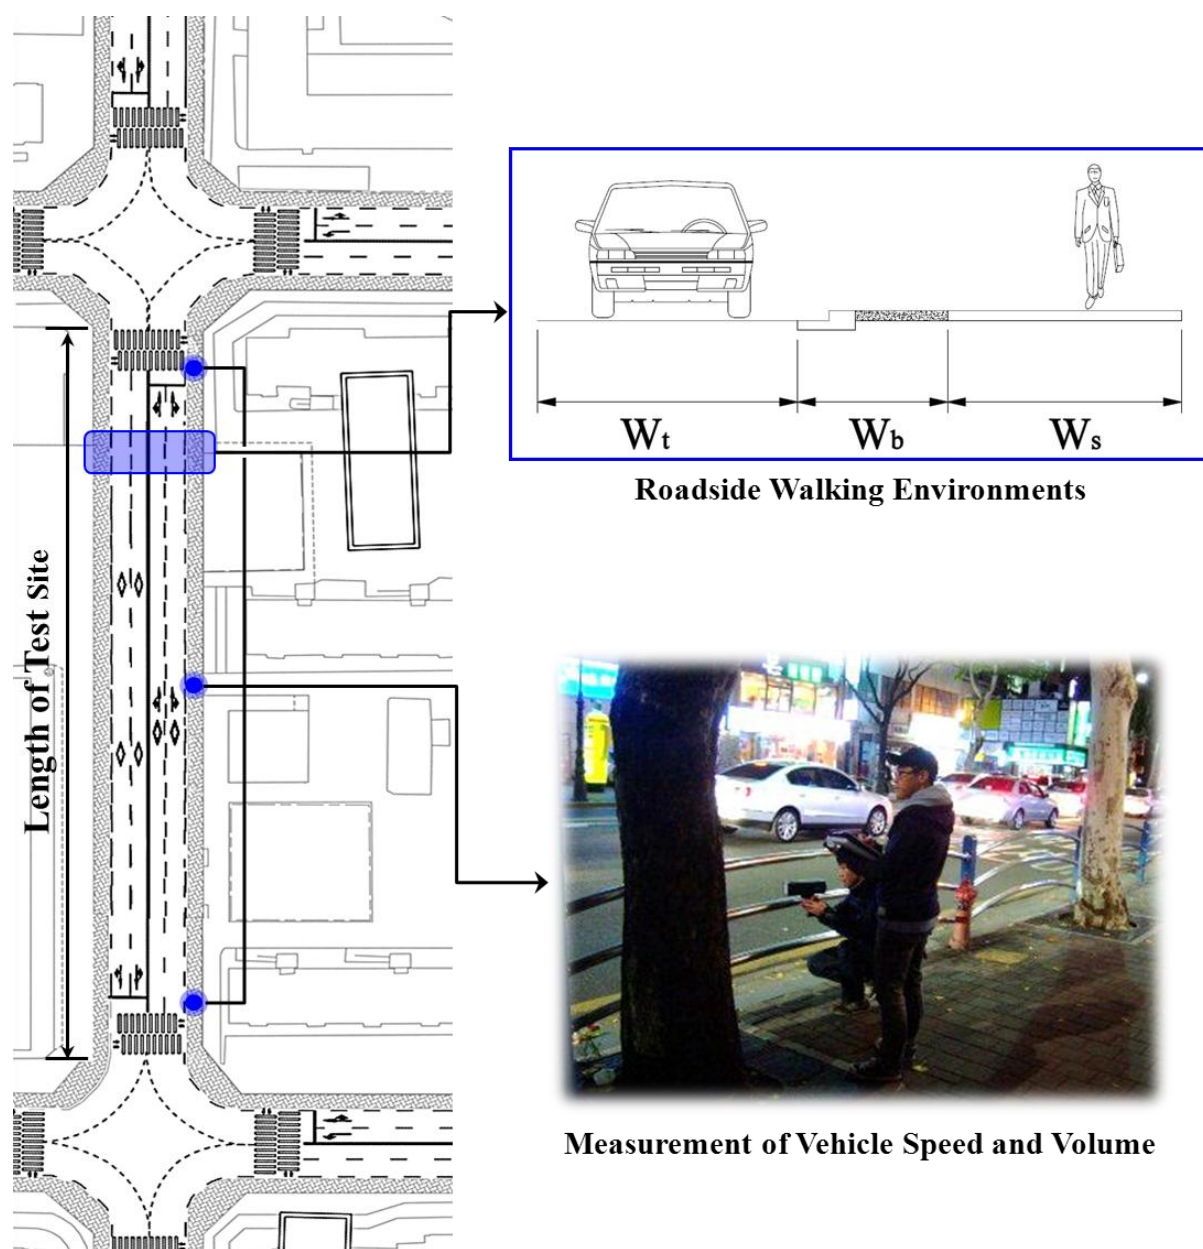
Typical Horizontal Plan of Test Sites, Sidewalks, and Pedestrian Intercept Survey
